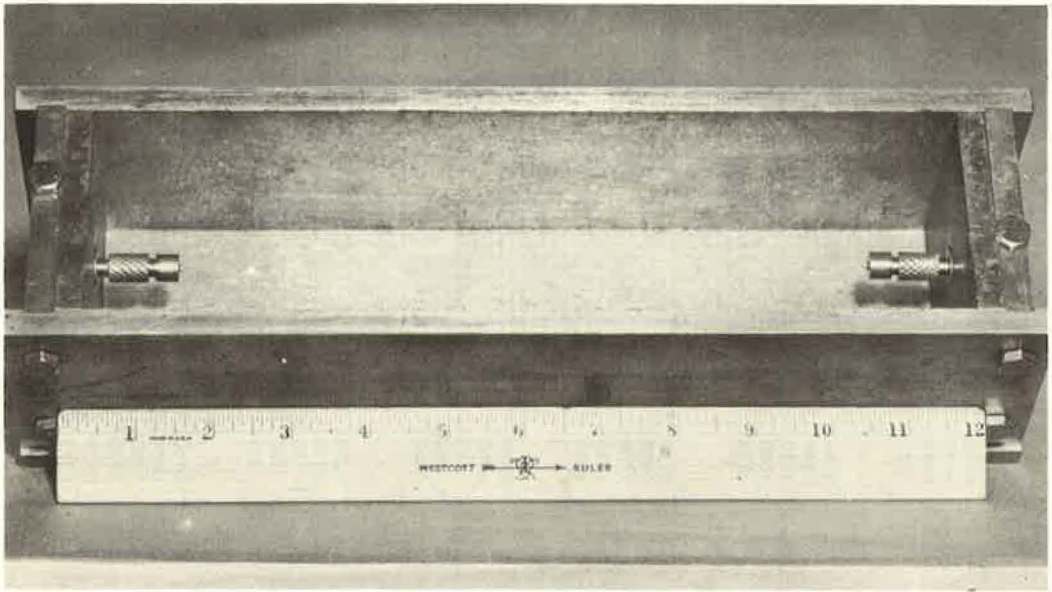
Steel mold, 3 by 3 by 11.25 in., for fabricating bars; note steel pins in end of plates for measuring AC bars.
